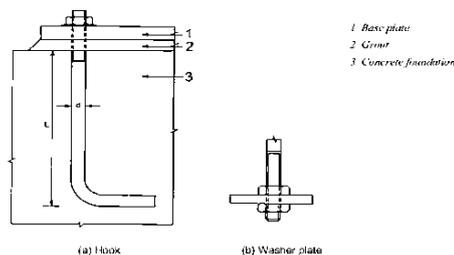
of EN 1993-1-8+NA, connections of anchorbolts
